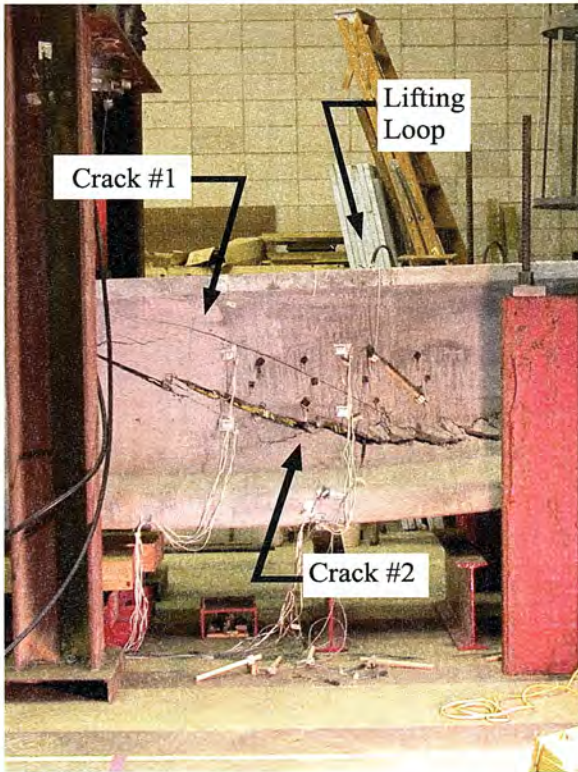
Shear crack at west end of large-scale shear test beam after failure.
